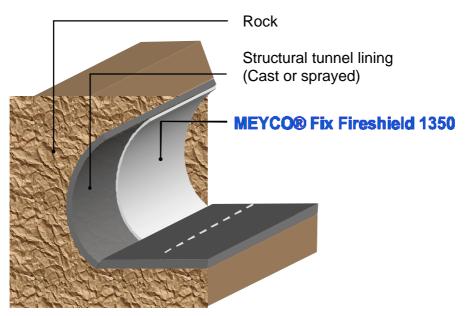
Sprayed application of passive fire protection layer to structural sprayed or cast concrete tunnel lining
